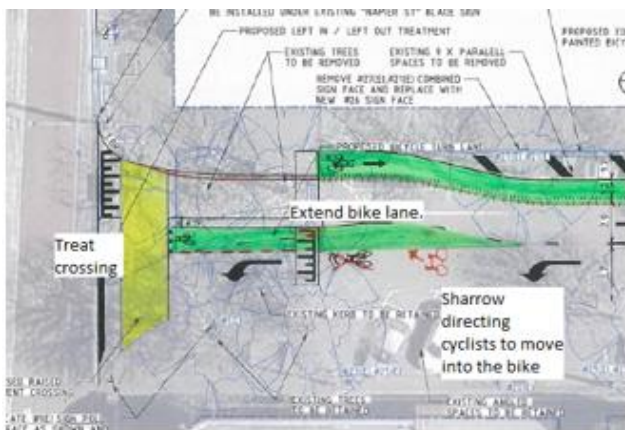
The south-bound bicycle lane should be extended with cyclists encouraged to separate from car traffic before the intersection. The raised pedestrian crossing should be treated to indicate is a shared space.
